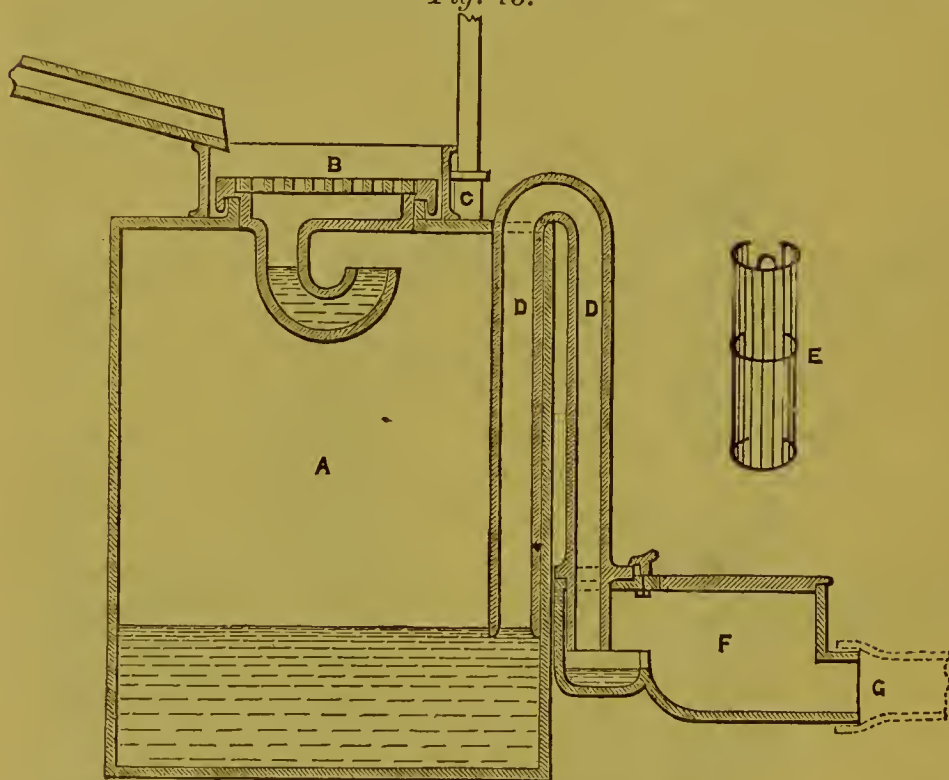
This apparatus consists of a cylindrical watertight iron or stoneware tank (A). This tank has a trapped inlet (B), which also forms a movable cover to give access to the inside of the tank, and a socket (C) for a ventilating pipe. The outlet consists of a siphon (D), so arranged that no discharge takes place till the tank is completely filled with liquid, when the siphon is brought into action and the contents are immediately discharged. The inner end of the siphon is protected by a wire strainer (E), and the outer end enters a discharging trough (F), which is made to turn round so that its mouth may be directed as required to connect the tank with the line of outlet pipes (G). This trough has a cover which can be removed to give access for cleaning.
